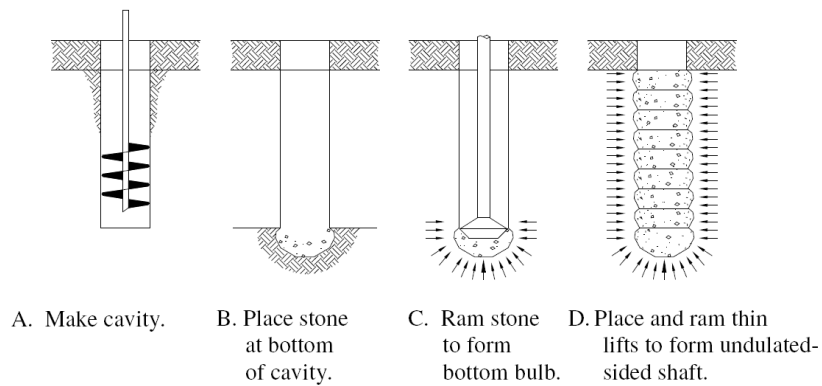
Rammed Aggregate Pier Reinforcement Installation Procedure (Fox and Cowell, 1998)
